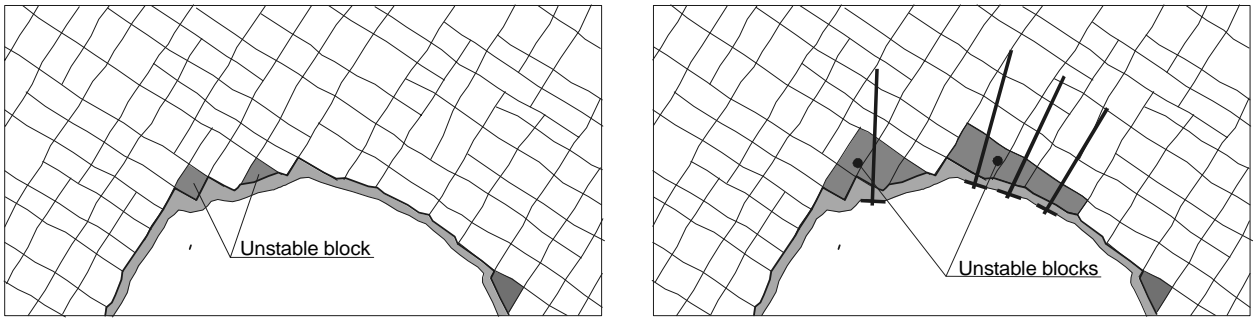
LEFT: Rock support by shotcrete or fibrecrete applied for reinforcement of unstable fragments and small blocks. RIGHT: The combination of shotcrete/fibrecrete and rock bolts offers attractive solutions for many rock mass conditions. This method has in many occasions replaced the in situ concrete lining, because it is quicker to install and can more easily be adapted to the actual rock mass conditions.
